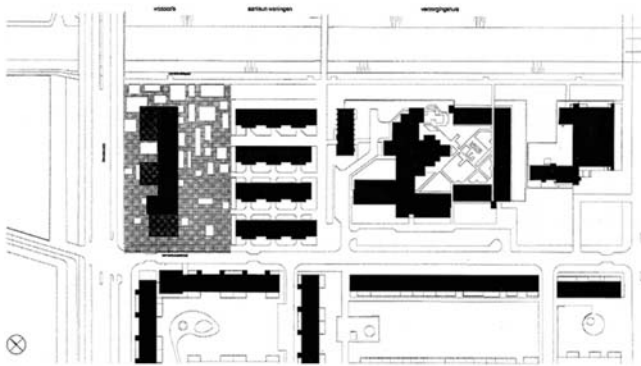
Site plan of the Wozoco's apartment building indicating surrounding context
